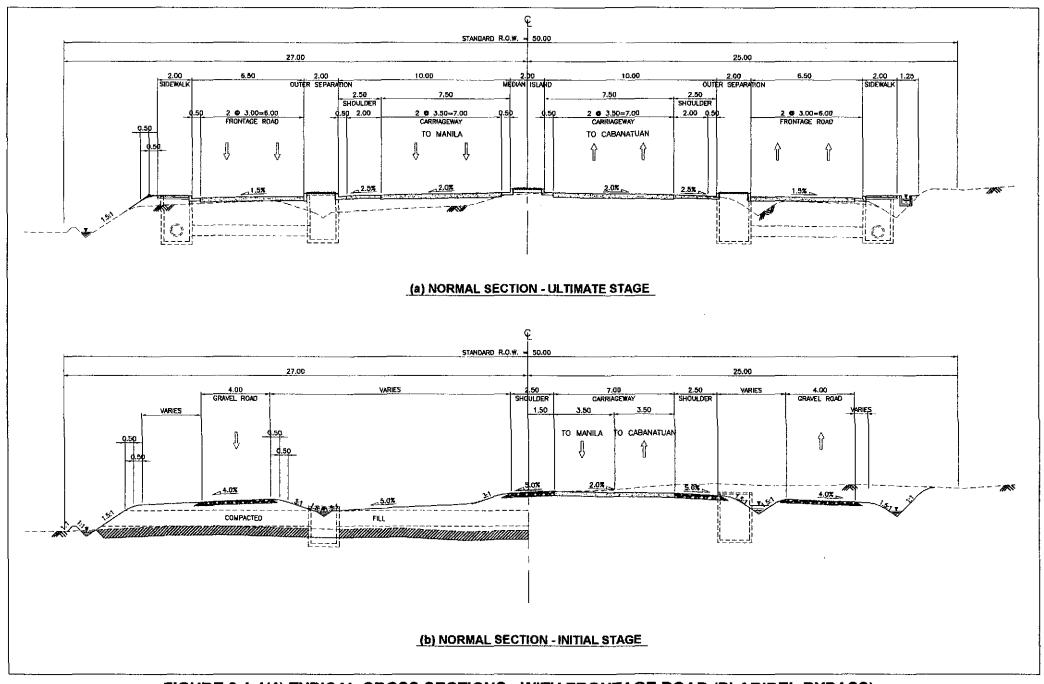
(1) TYPICAL CROSS SECTIONS - WITH FRONTAGE ROAD (PLARIDEL BYPASS)
